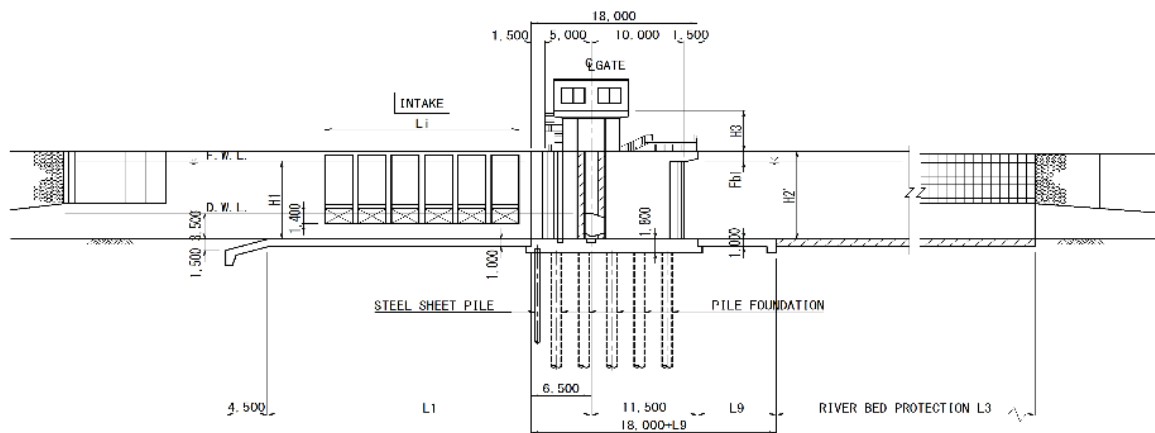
Typical Standard Section of the Weirs (Example of KT-3)
